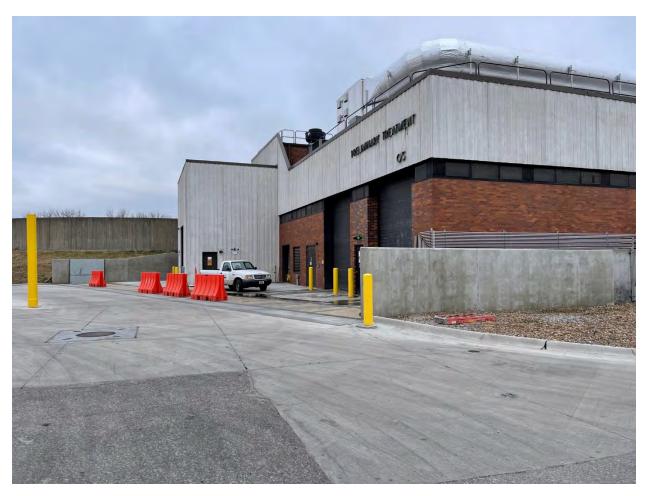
Flood Wall and Flood Gate Complete on East Side of Main Pump Building
